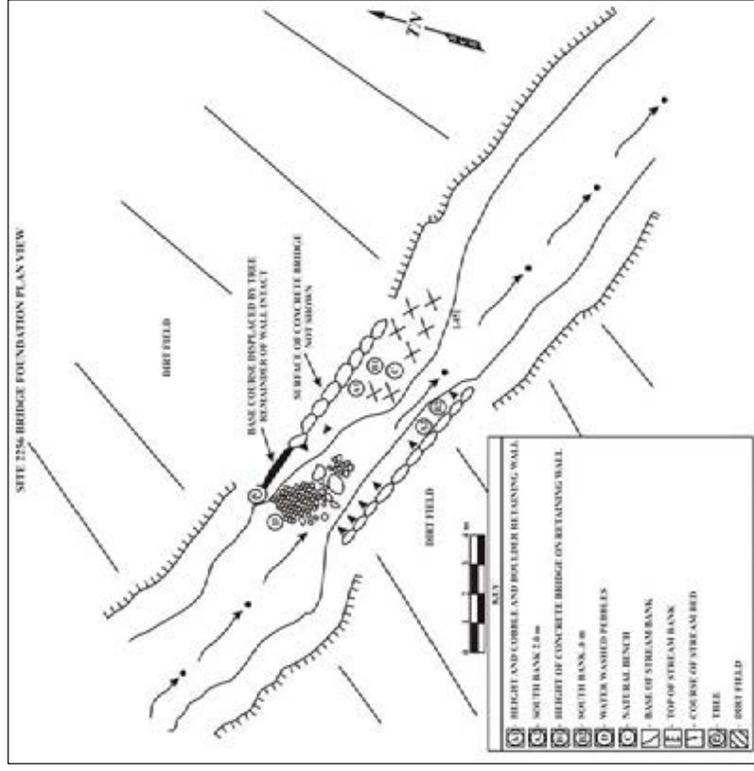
Planview of Site -2256 Bridge Retaining Walls.
